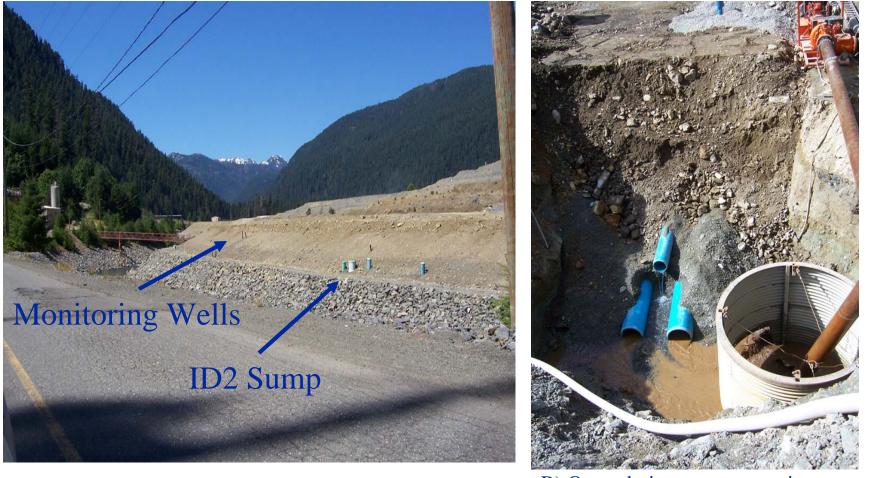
New Outer Drain 0+850 to 0+1350 - Pipe Installation
